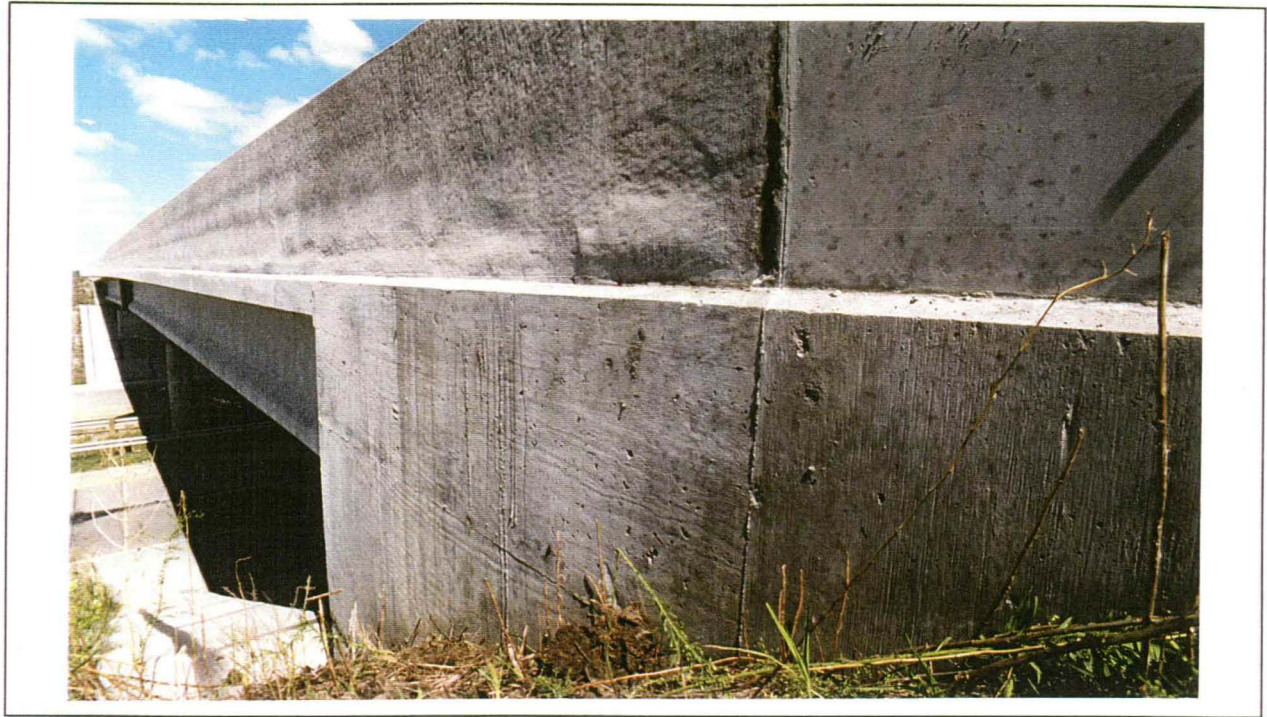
View of bridge abutment and barrier rail showing inconsistent concrete surfaces, “legibility” of barrier reinforcing steel through concrete, and results of leaky joints in formwork.
